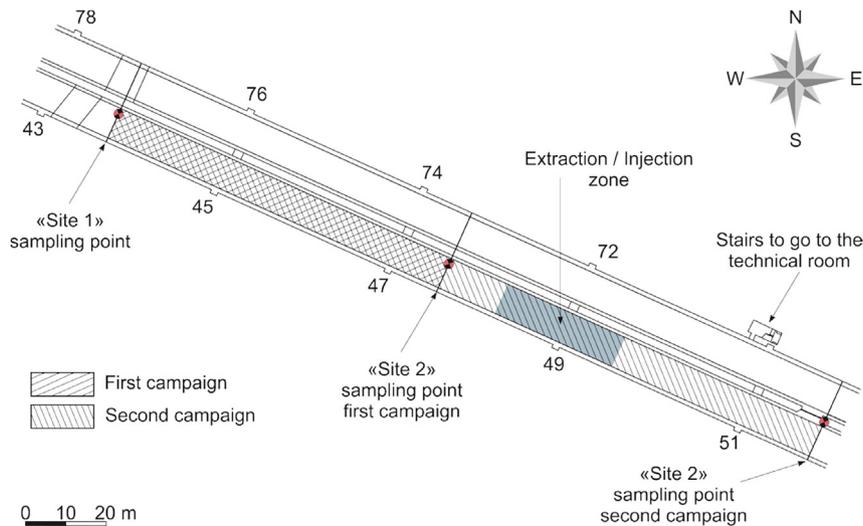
Plan view of the tunnel test section for the first and second tunnel campaign.
